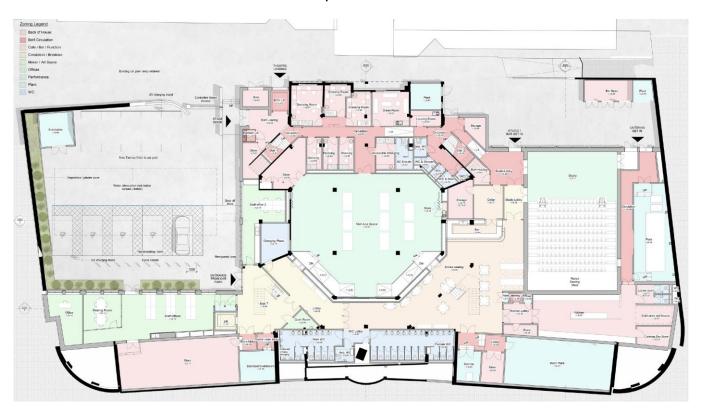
Existing & Proposed Lower Ground Floor Layout
